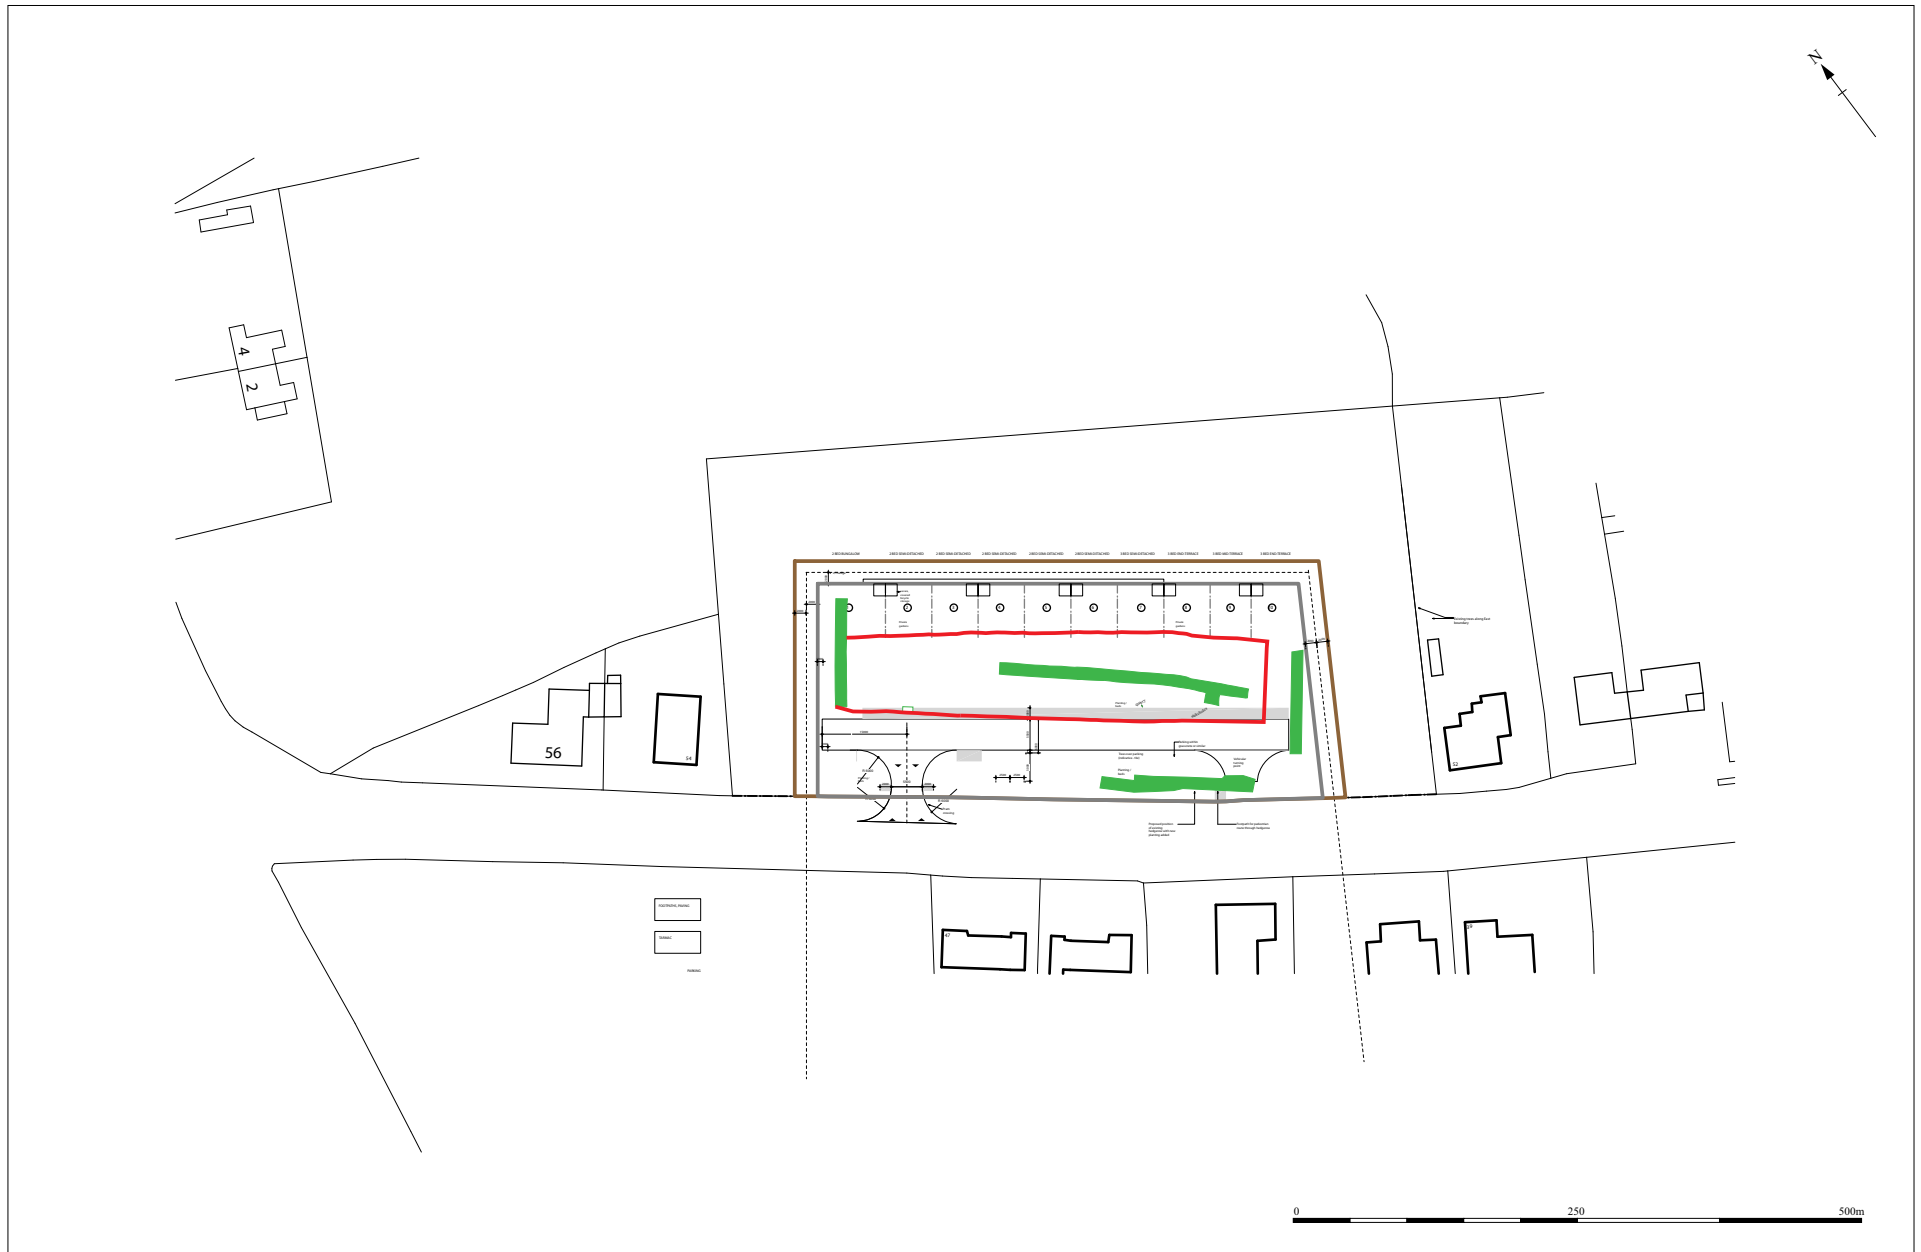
Development area showing excavation area (red) and trenches (green) overlaid on client file 08.358 Site plan D
